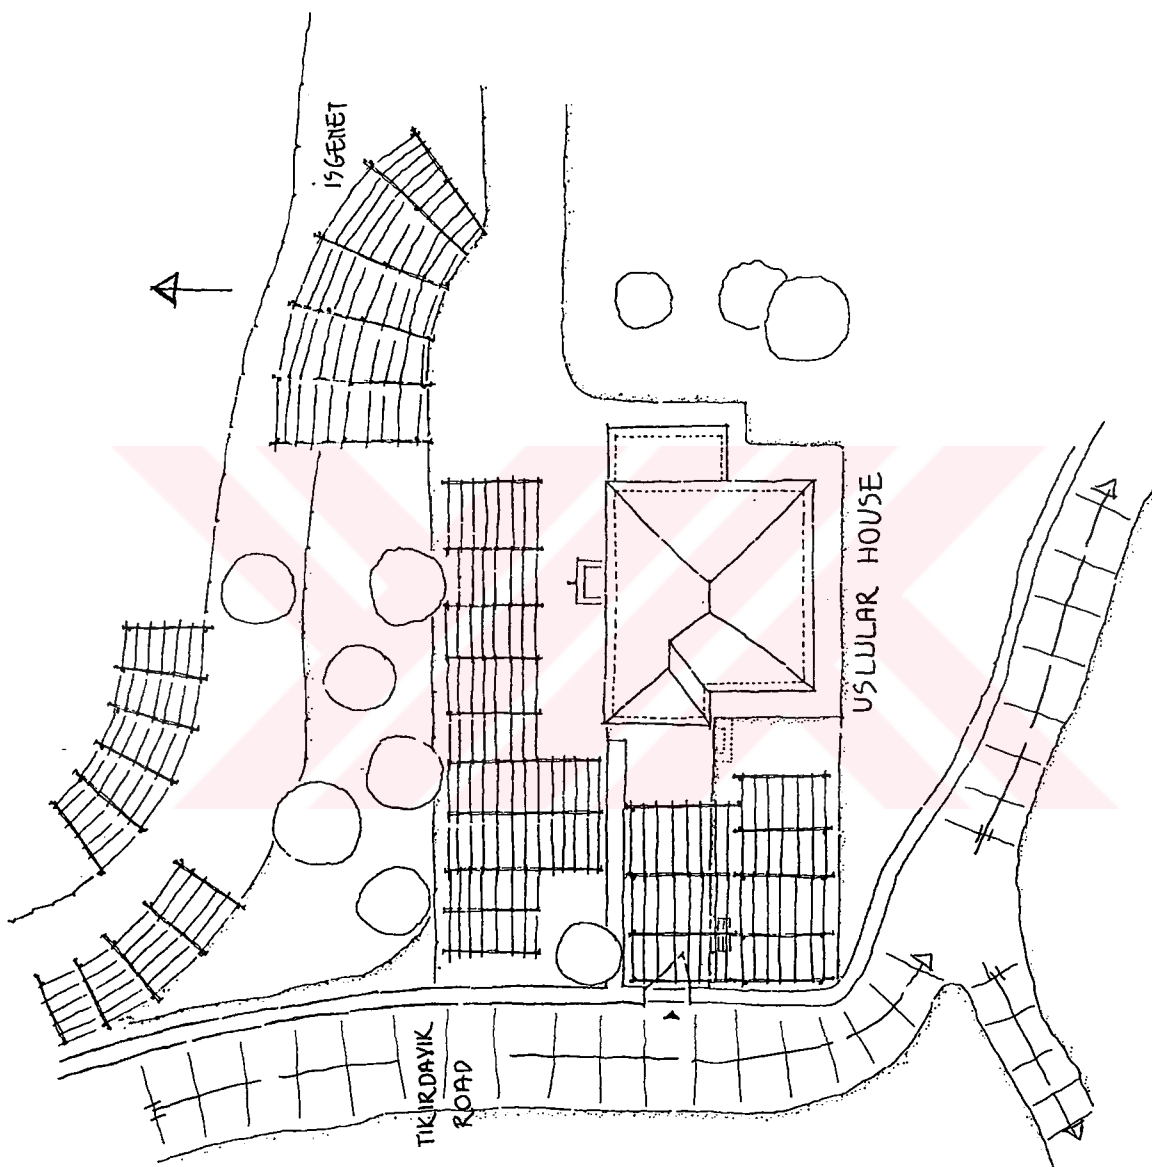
Schematic site plan of Uslular House - not to scale.
